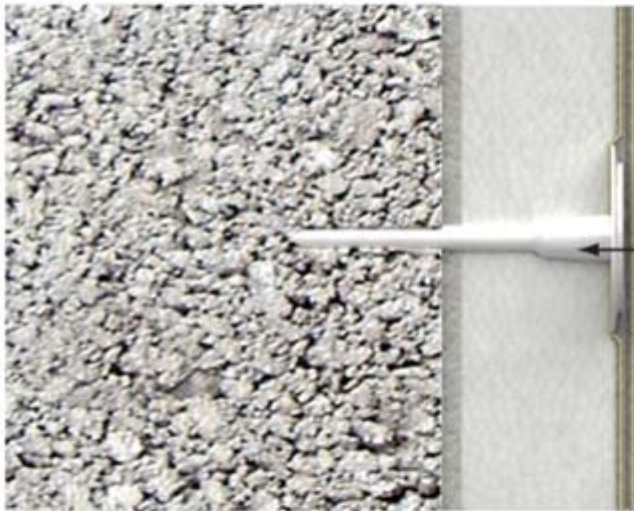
Typical Detail – StoTherm Retrofit Classic K – Horizontal Fire Barrier
